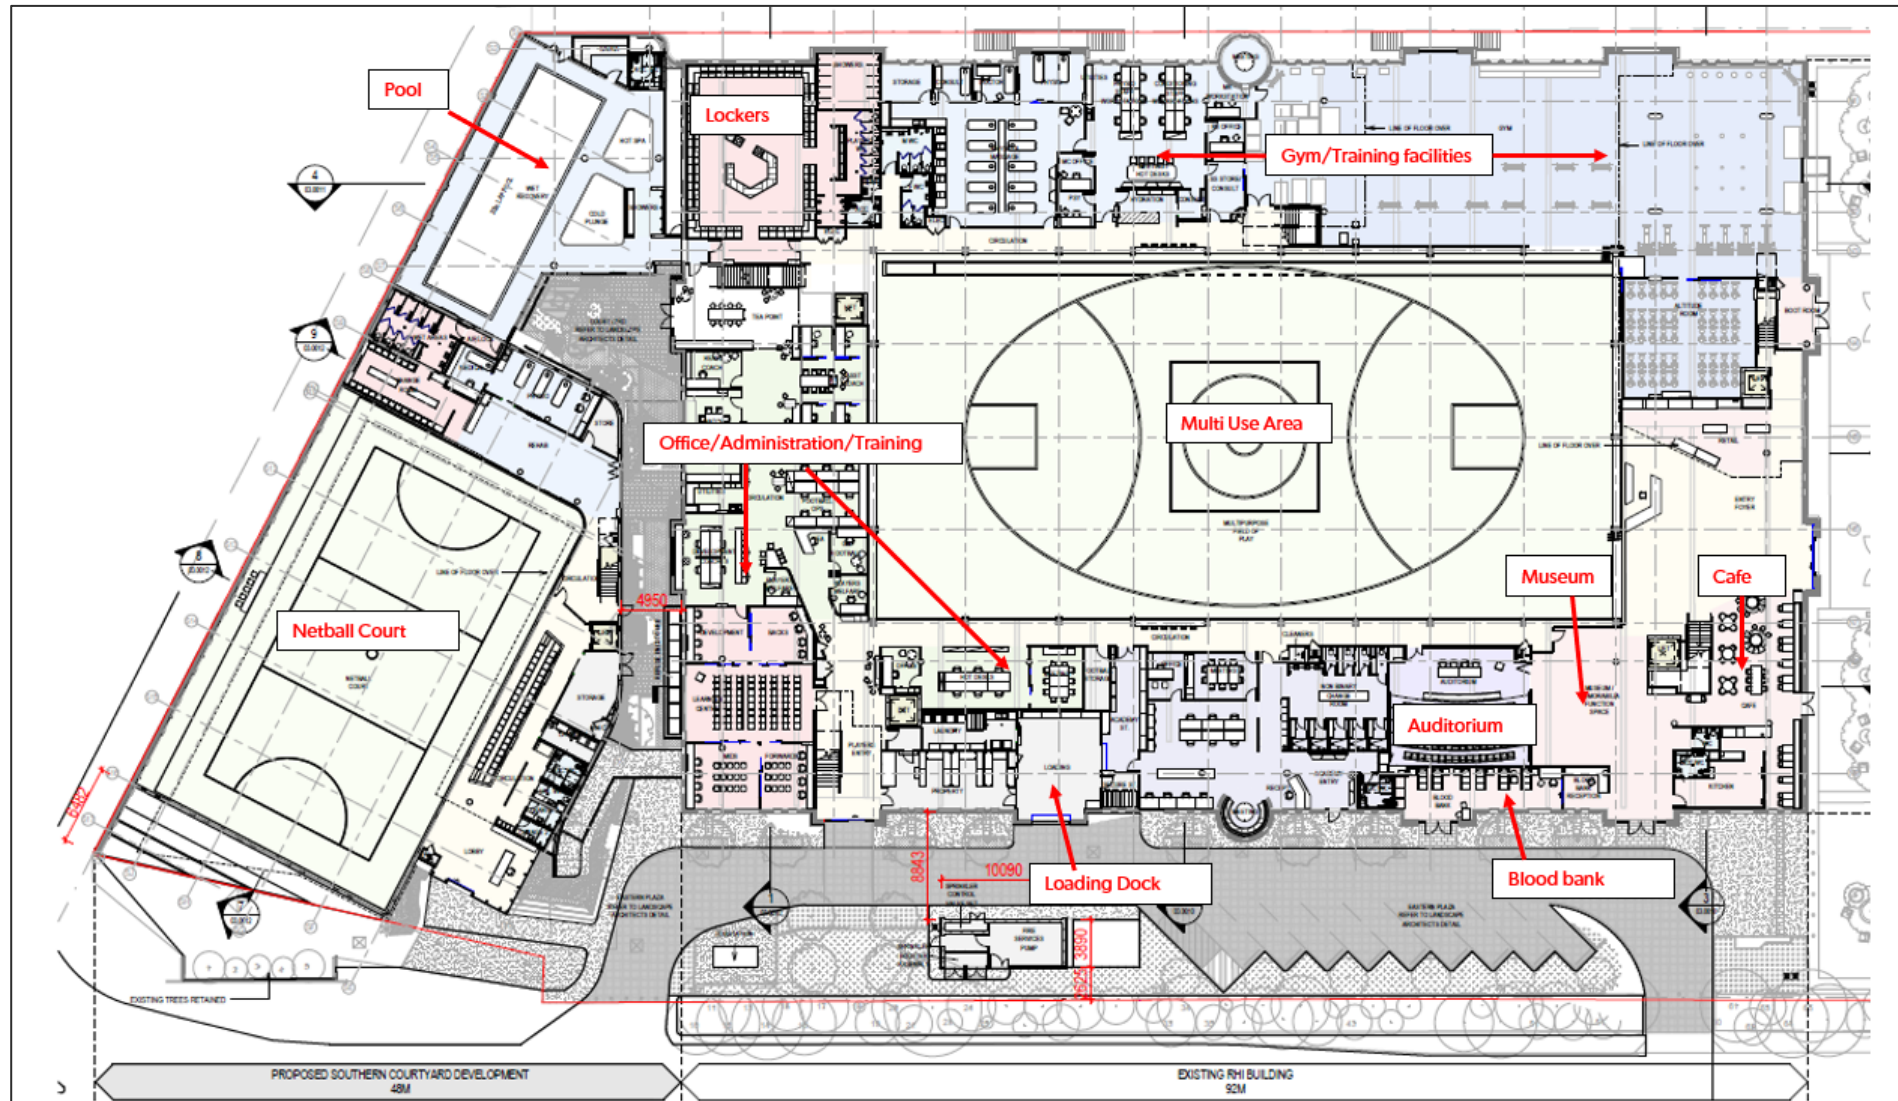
| Proposed Ground Floor Plan (Base source: Applicant's Architectural Plans)
